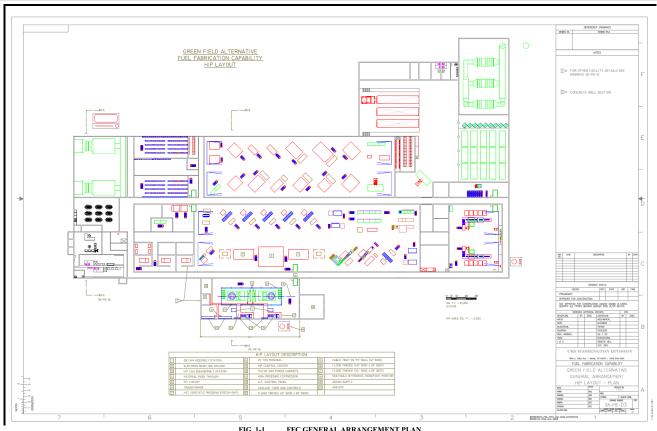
FFC GENERAL ARRANGEMENT PLAN
